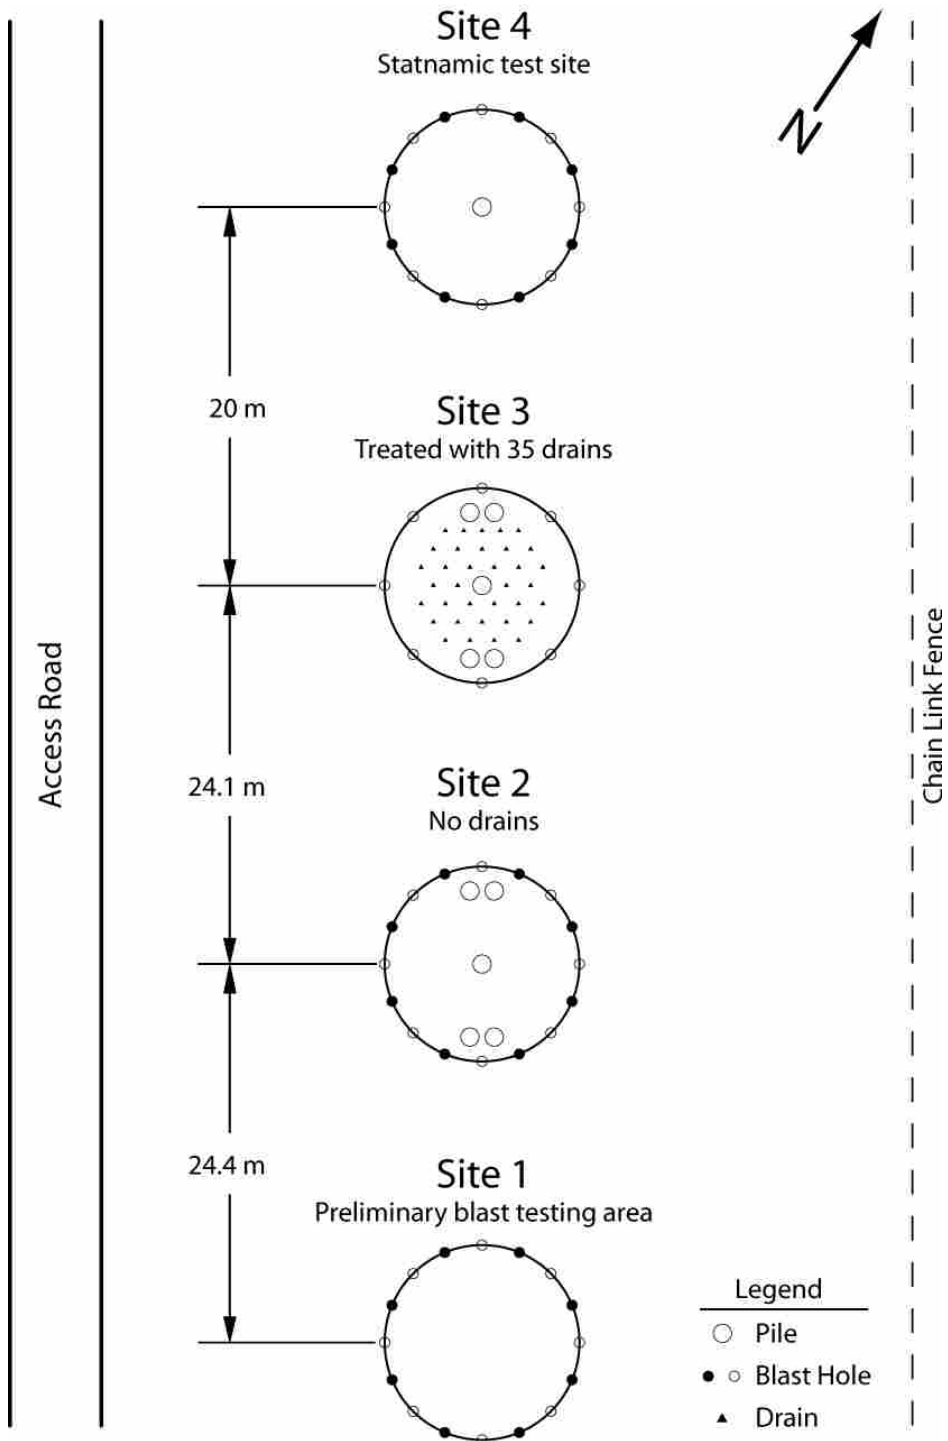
Detailed schematic drawing of the layout of the test site.
